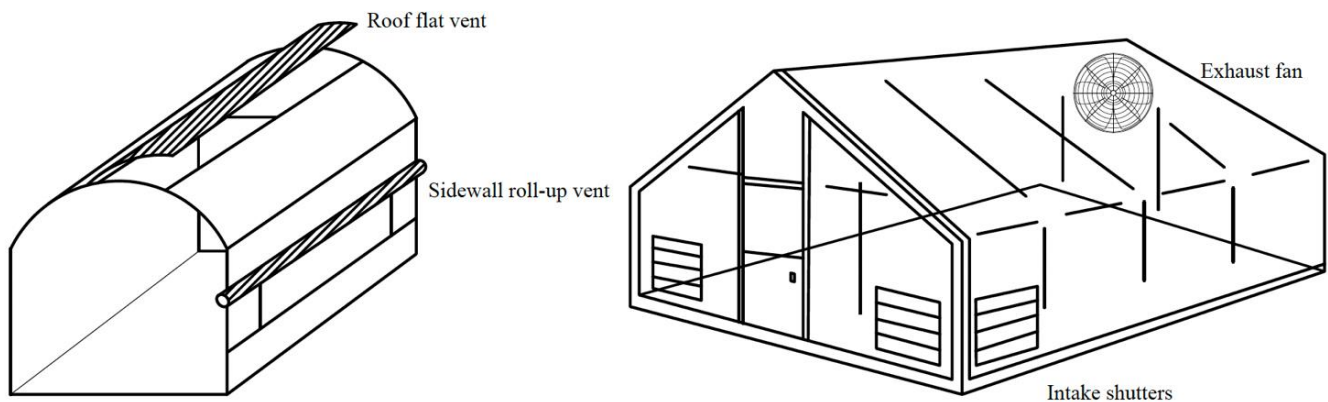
Greenhouse ventilation of sidewall roll-up vent, roof flap vent and exhaust fan system.
